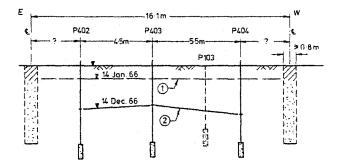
Cross-section of trench drain installation at Guildford Surrey, showing the long-term effect of drainage (largely after Simons, 1977). (1) Approximate piezometric level before drainage, based on piezometer P103. (2) Position of the piezometric surface about 10.5 years after installation of the drains.
